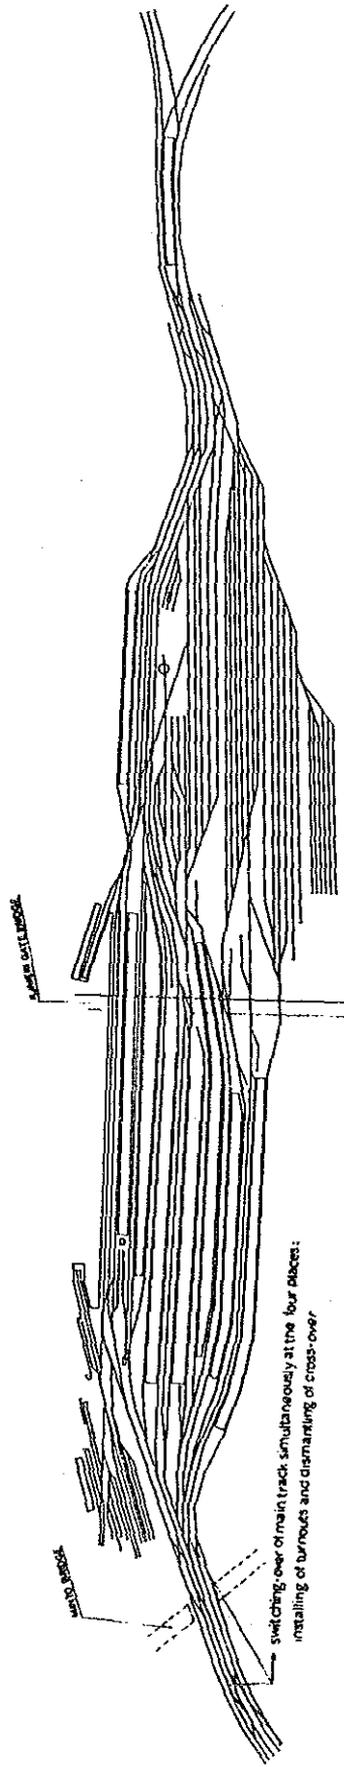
(3) Switch-over Steps in New Delhi yard
